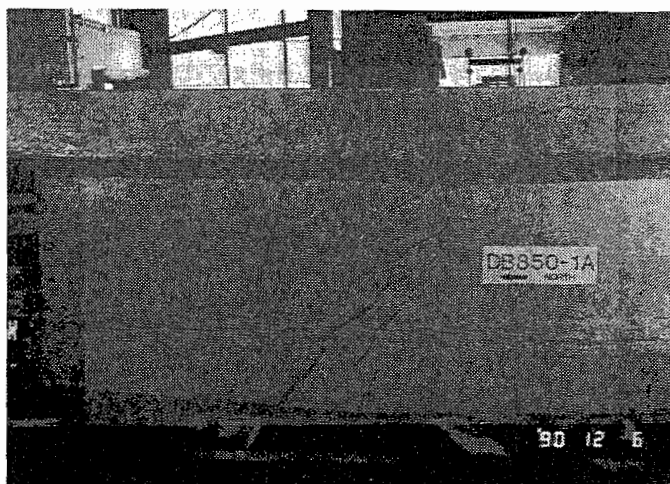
Photograph of Web Shear Cracking and Bond Failure, DB850-1A
